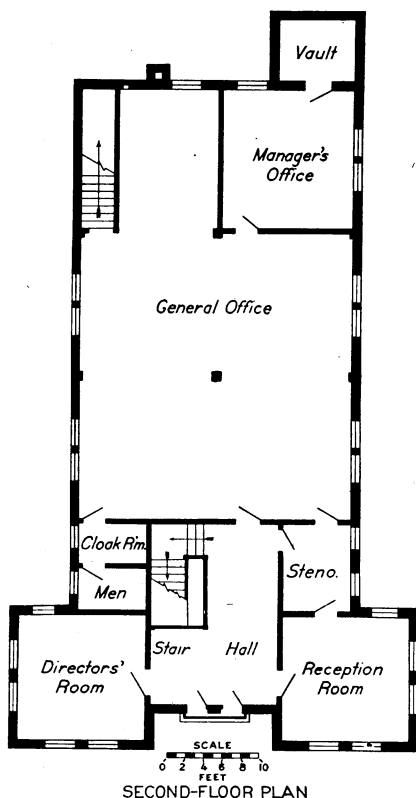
Second-floor plan of the Hastings Potato Growers' Association Building
